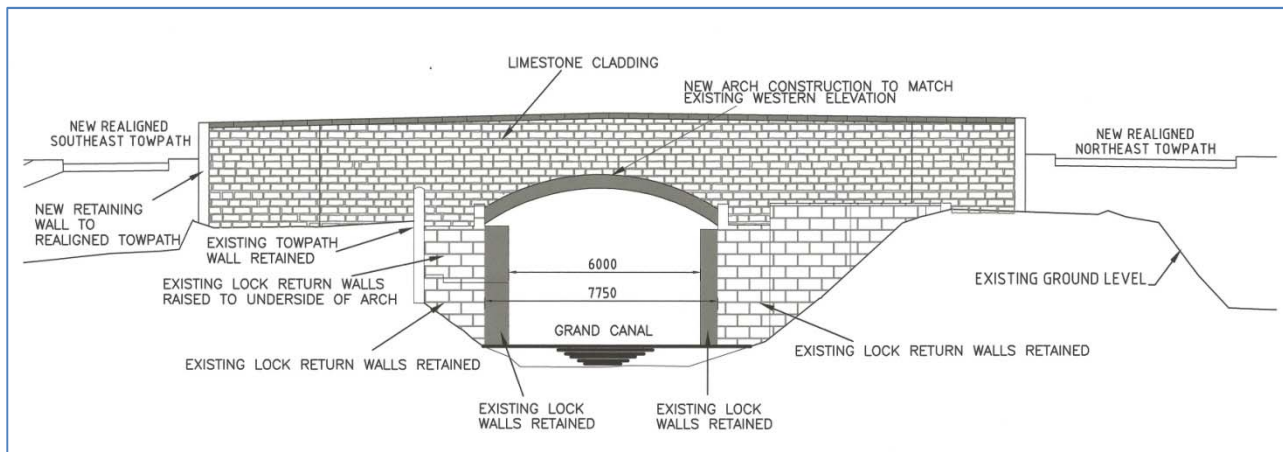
Proposed Eastern Elevation of 12th Lock Bridge Extension
